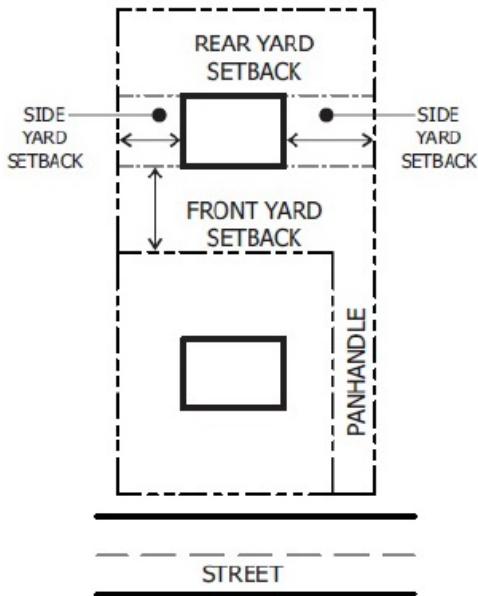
H: Yard and front yard setback locations on a panhandle lot.
